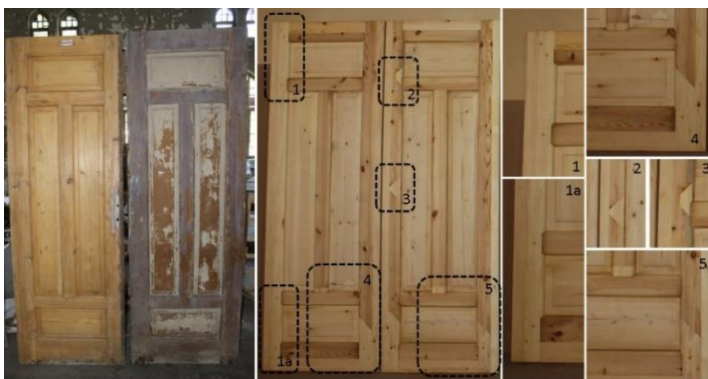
First floor door example, details of the consolidation technique 2012-2017 (Osmanoğlu)
